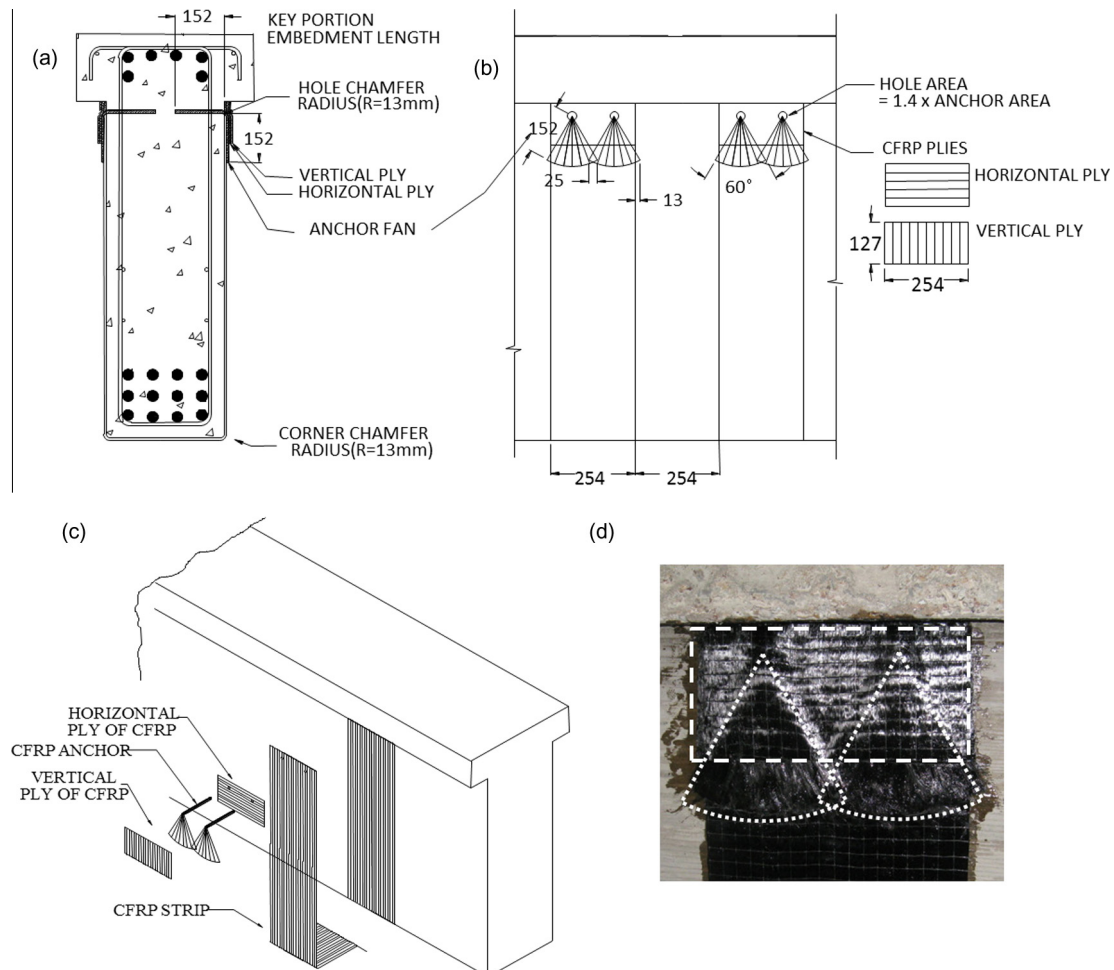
CFRP strip and anchor details (all units are in mm) – (a) cross-section, (b) side, (c) isometric view, (d) photo of CFRP anchors.
